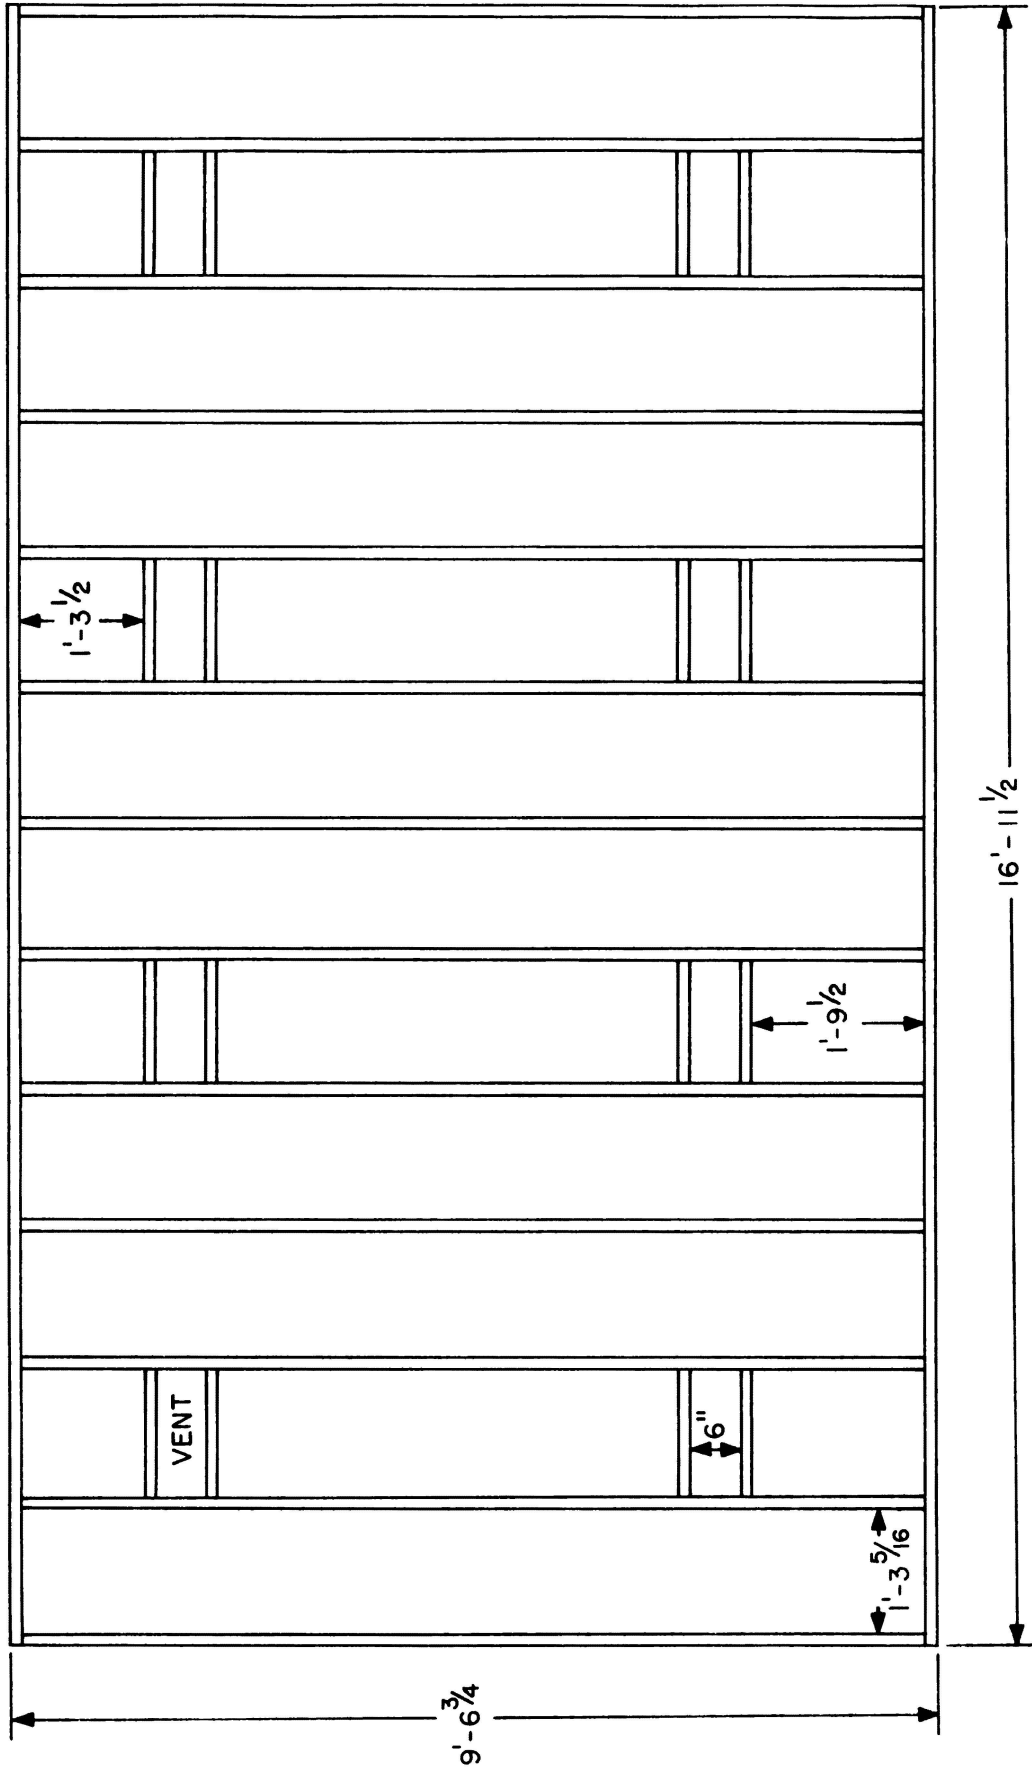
Framing of north wall. All lumber is nominal 2 x 4. (Scale 1/2" = 1')
